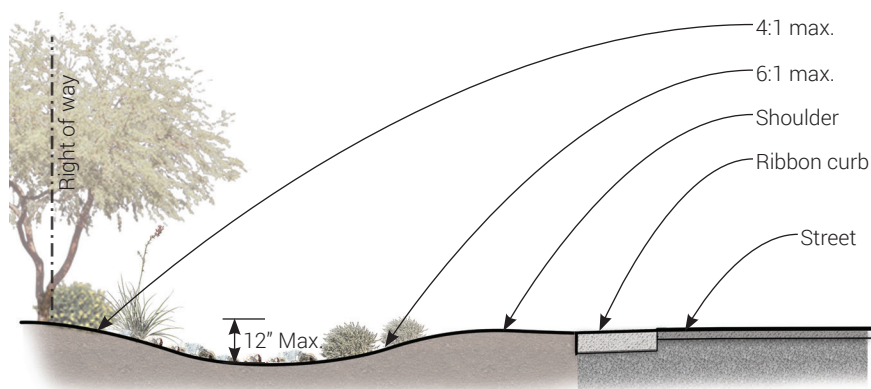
TYPICAL CROSS SECTION FOR ROADSIDE SWALES
